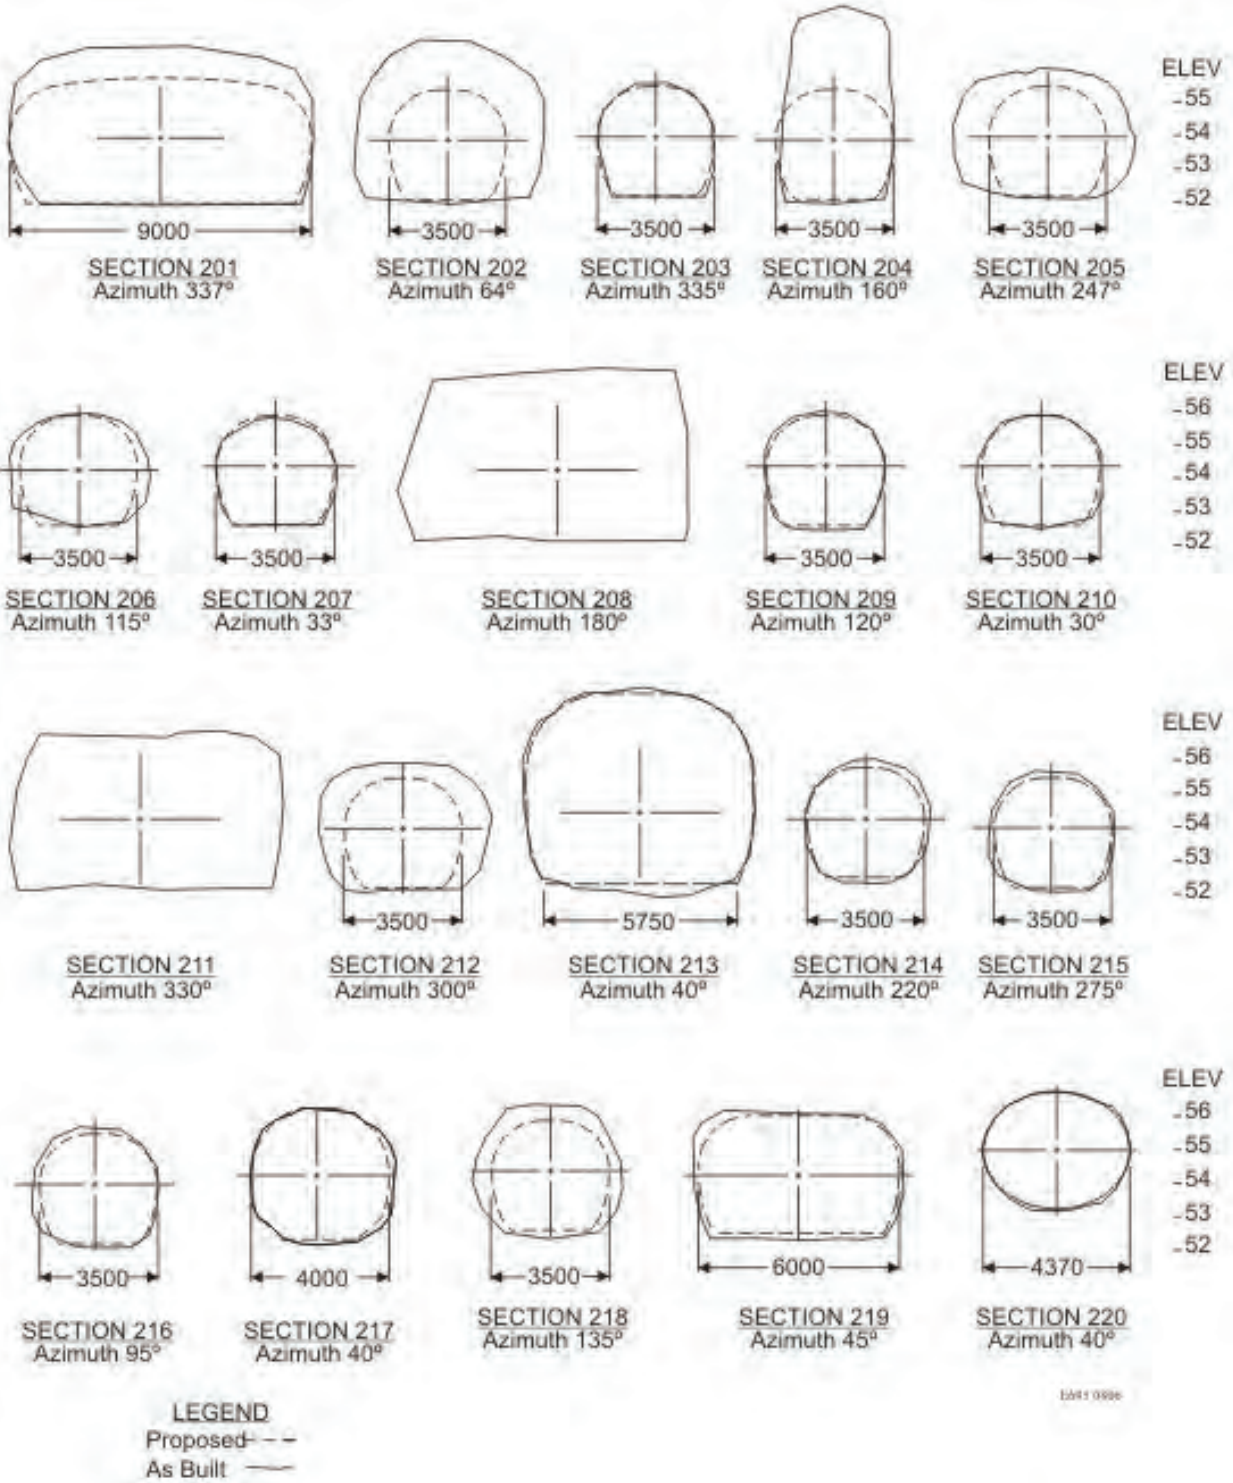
240 Level Room Shapes. Elevations are above mean sea level. URL Shaft collar is at 289.9 m elevation.
